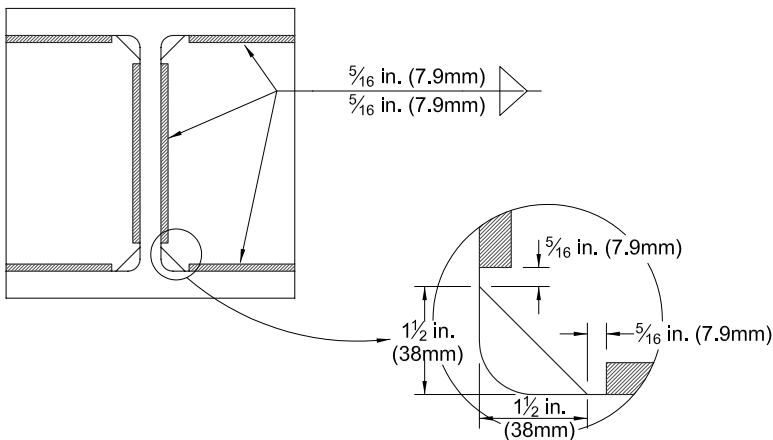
Recommended placement of stiffener fillet welds to avoid contact with "k-area."
